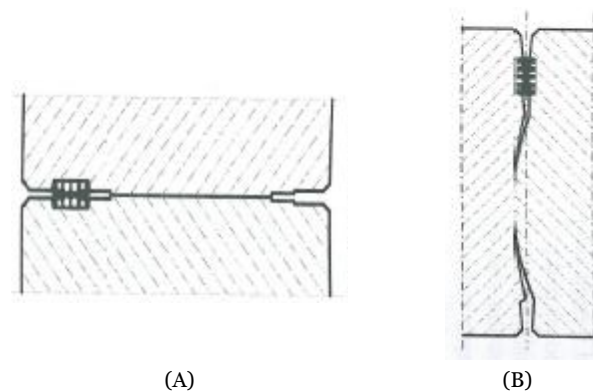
Regular longitudinal (l) and lateral (r) joint shapes for concrete lining tunnels [70; edited]
